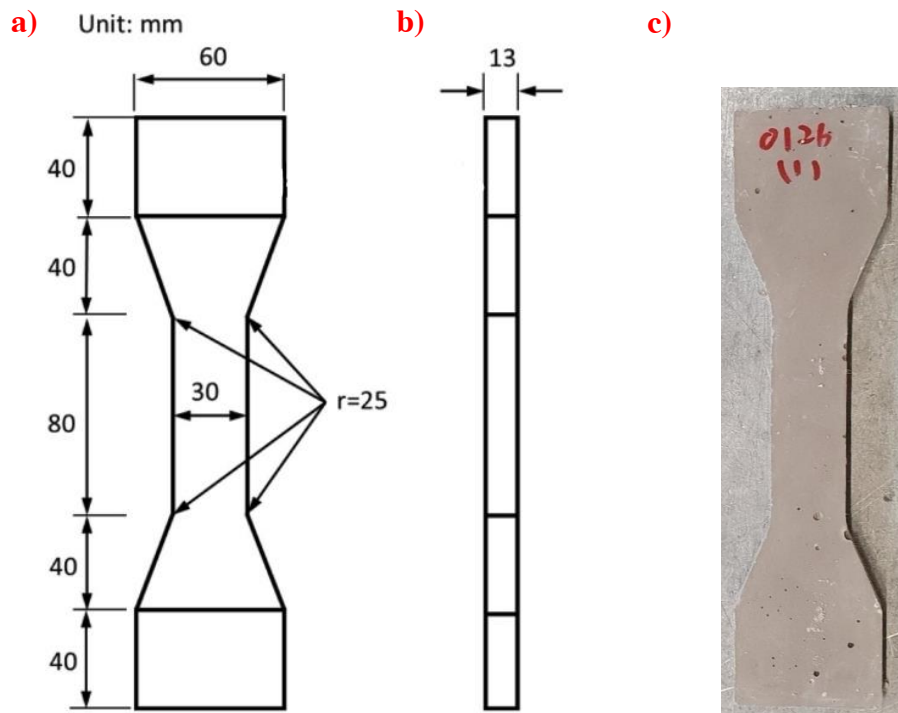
Details of SHCC dog bone specimens: a) front view [53]; b) side view (mm) [53]. c) typical SHCC dog bone specimen
